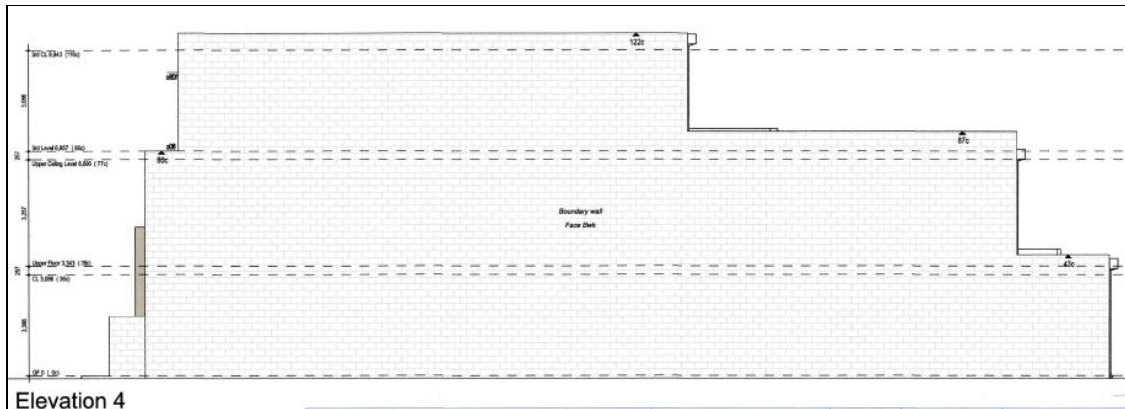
Elevation 4 as Privately Certified and submitted to the City of Cockburn's Building Department:
